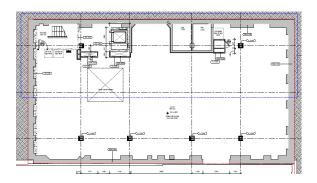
Beneficial House—Floor Plan, concourse level—showing proposed new stair and lift. (Source: Make + Architectus, A-285-11-03-0, 17 April 2019, similar to DA 2005 set issued 14 February 2017)
